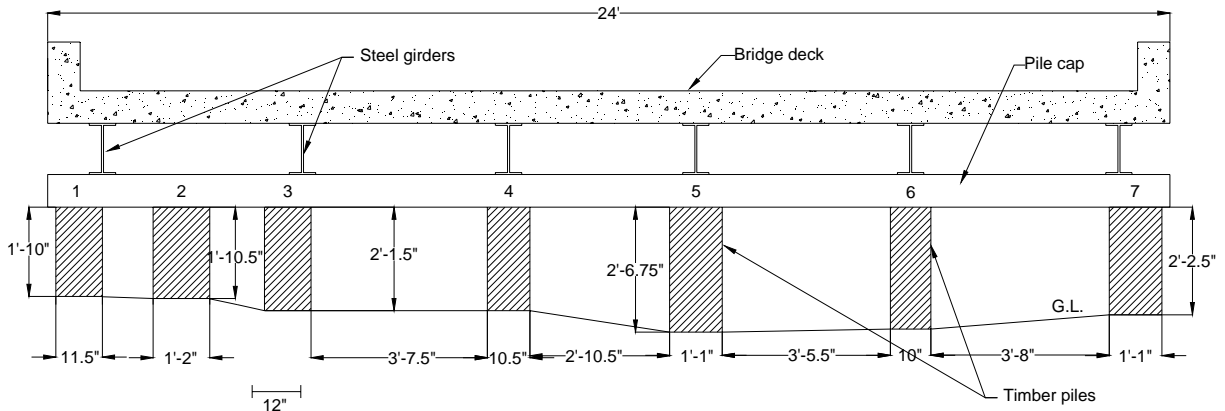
Plan view of the bridge abutment (Bridge No. 243470 – Marshall County)
